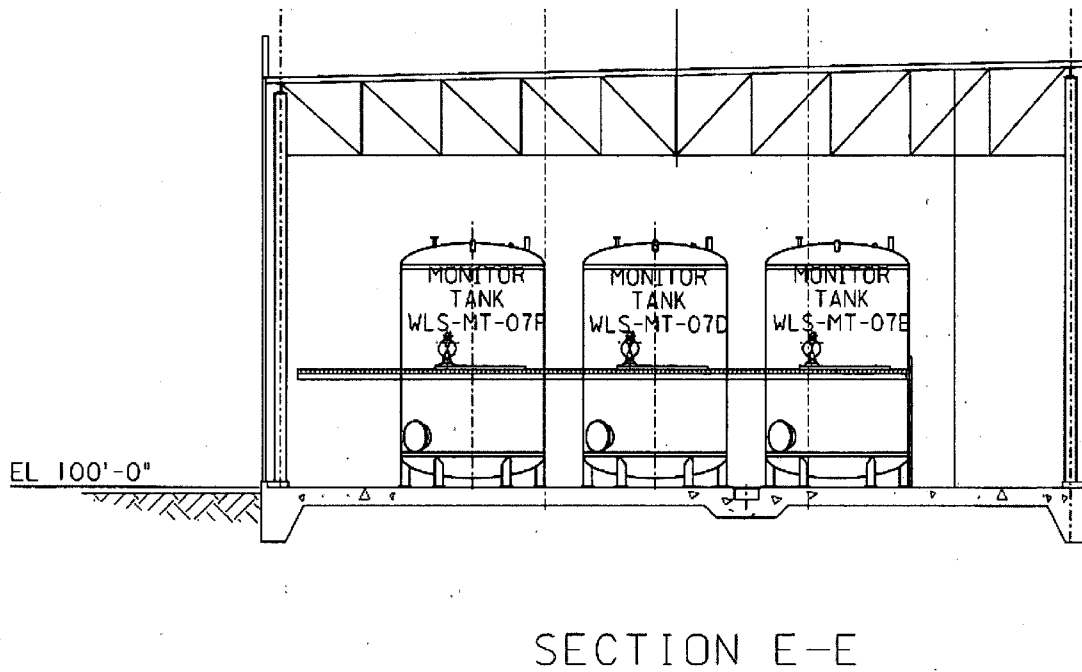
SEB1-02- 2: Section E-E Radwaste Building
